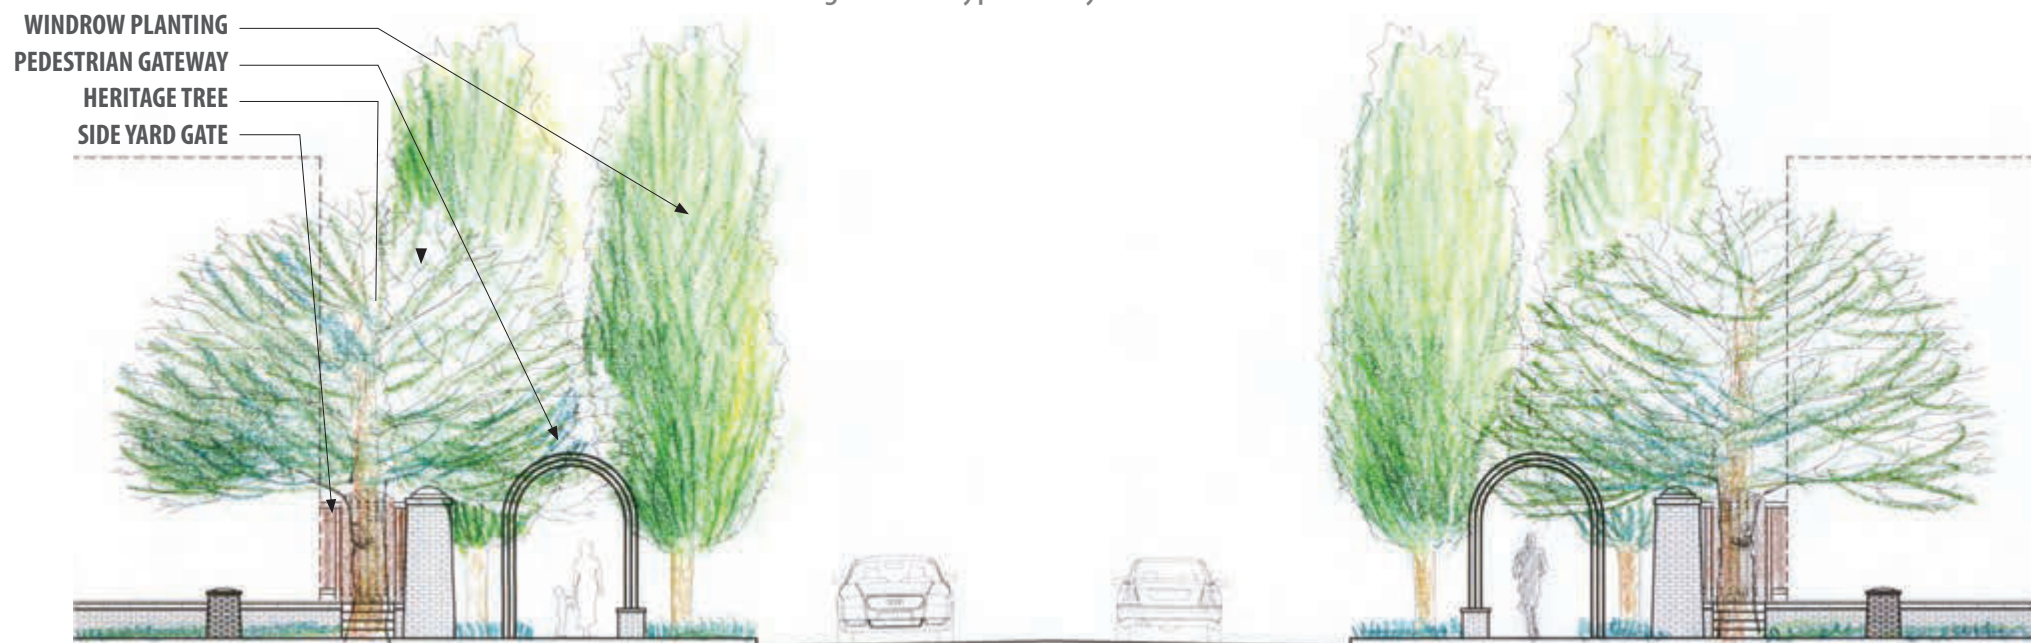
Street elevation illustrating windrow trees on special streets that connect to water
